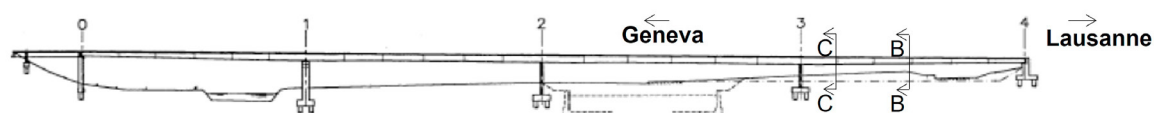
Elevation of the Venoge Bridge, indicating the locations B and C along the main girder where the strain gauges are installed.
